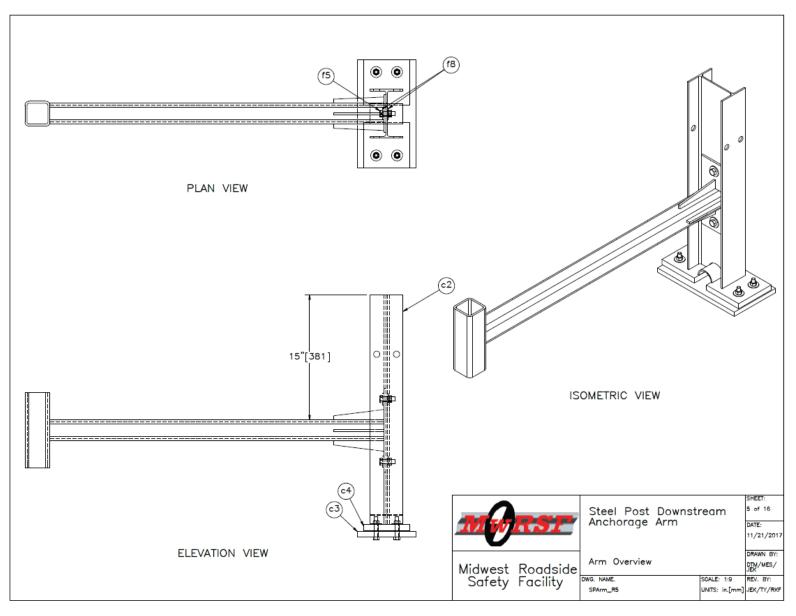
T-Shaped, Breaker Bar Design – Arm Overview
